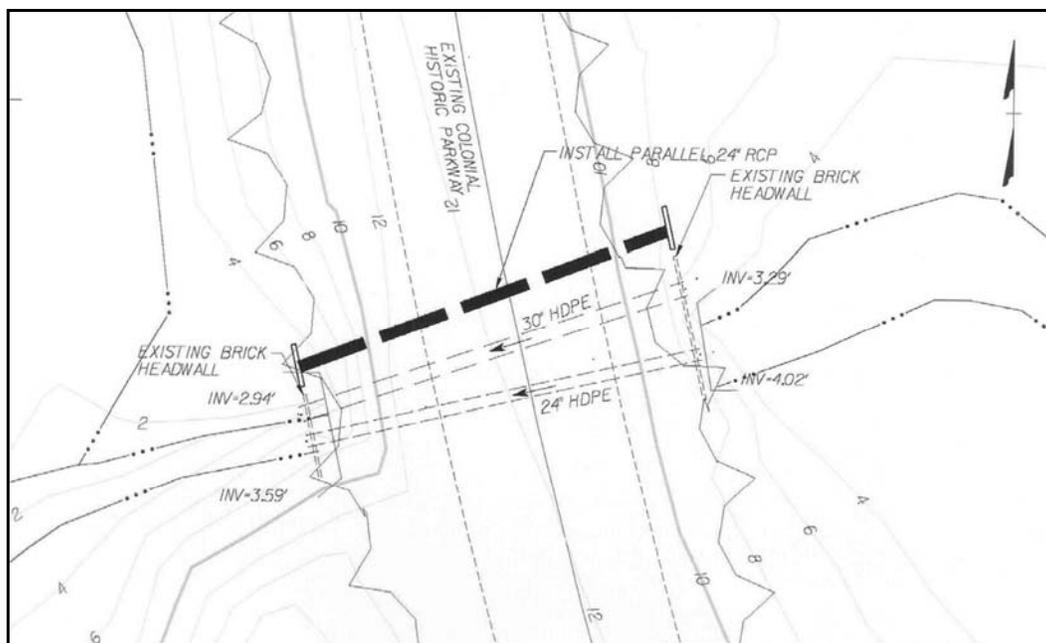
Concept Plan of Alternative 3 at Site A (Add Parallel 24-inch RCP); Source: NPS, 2005
